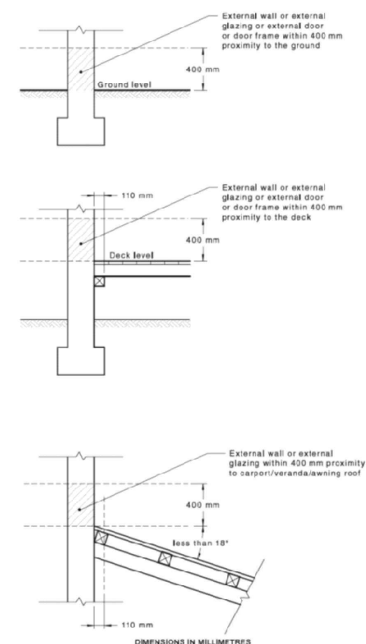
EXTERNAL WALLS OR EXTERNAL GLAZING, OR EXTERNAL DOOR/FRAMES WITHIN LIMITS ABOVE GROUND, DECKS, CARPORT ROOFS
